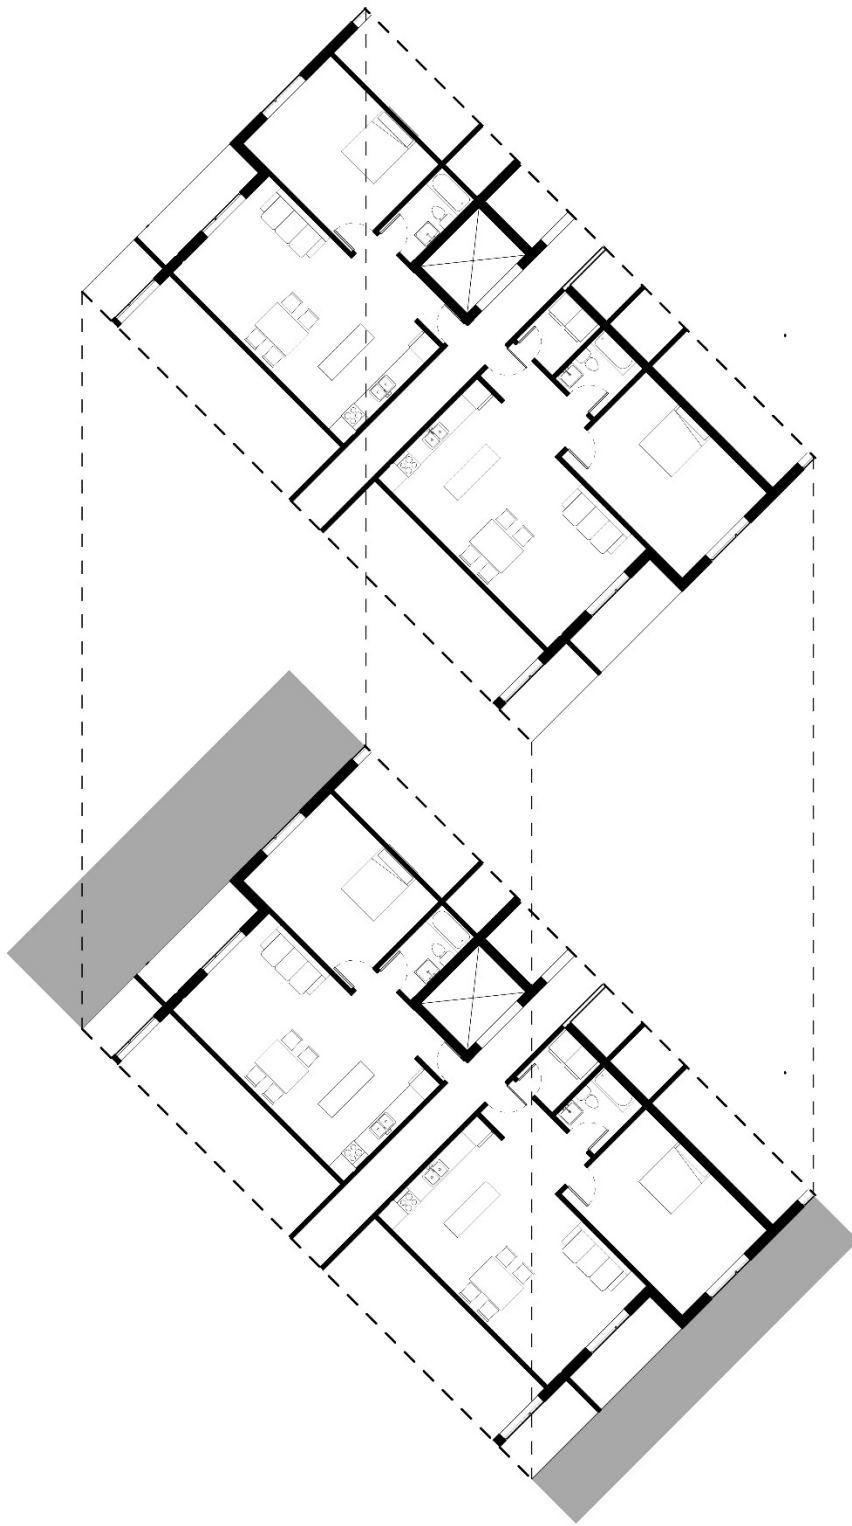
Plan of two apartment units in a double loaded corridor (Source: Author)
